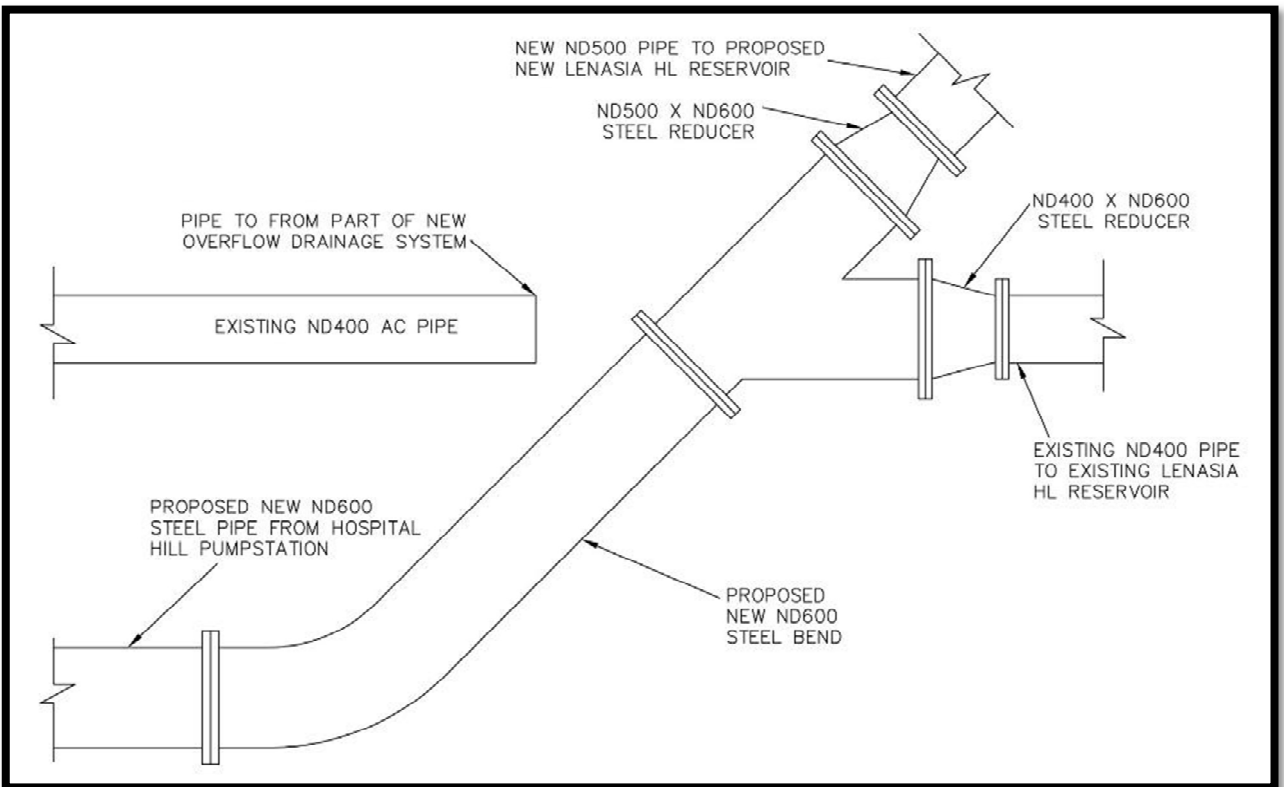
Connection of new steel pipeline to existing pipe at Lenasia HL reservoir
